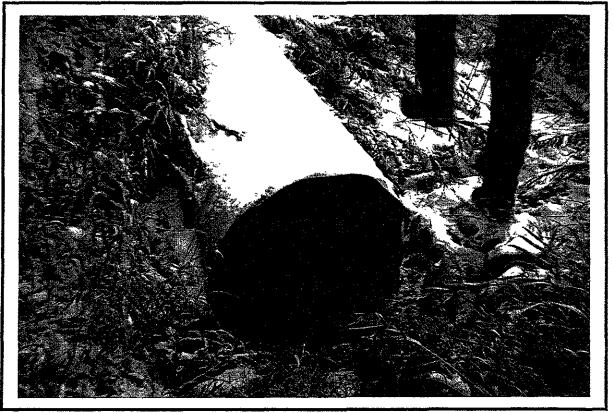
Looking at the inlet of the cross culvert from the ditch on the North Side of Steeles Avenue.
